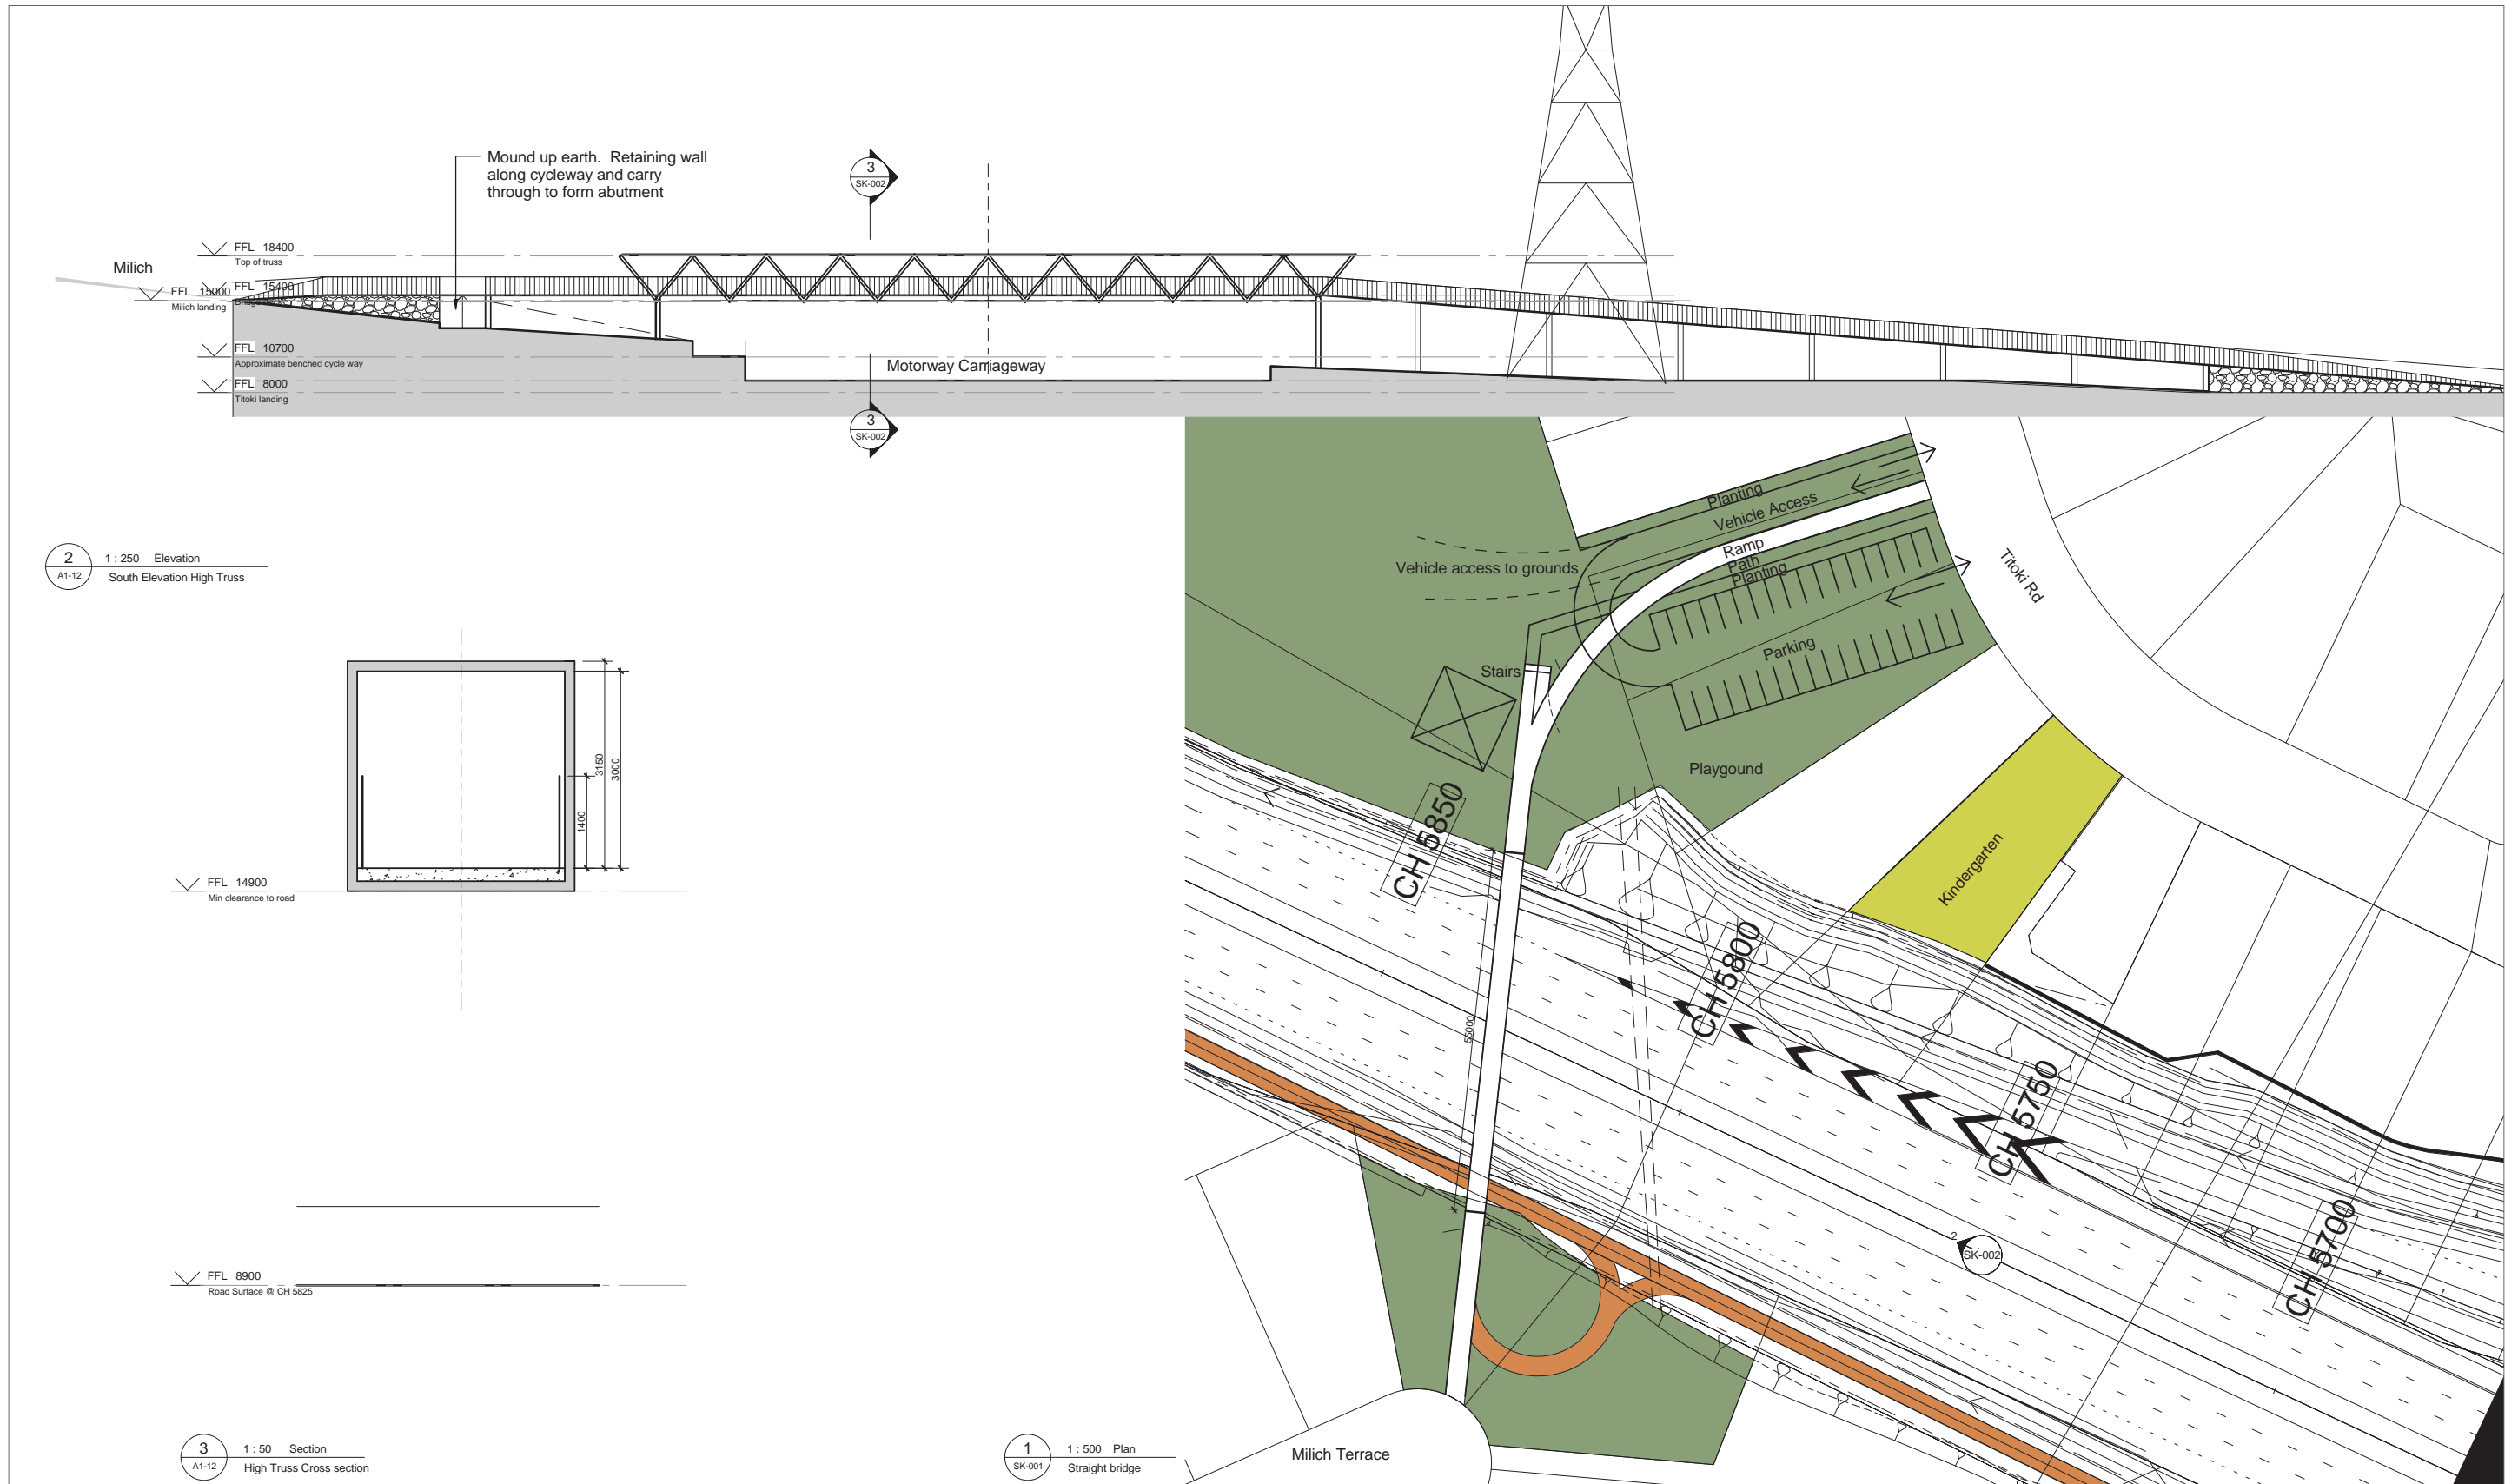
Potential future Milich Avenue - Jack Colvin Park footbridge - secondary concept option, high truss, straight plan
